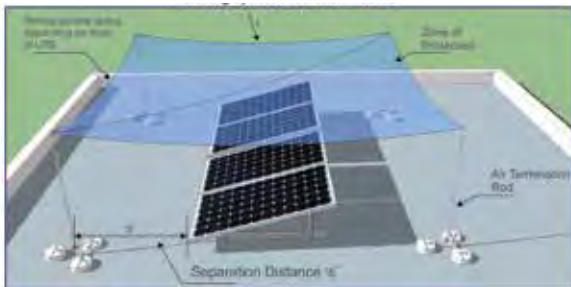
Using the rolling sphere protection method to protect a rooftop PV installation.
